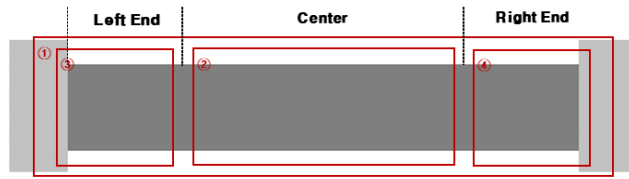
Image Capture Location of Reinforced Concrete Horizontal Members (Beams)
